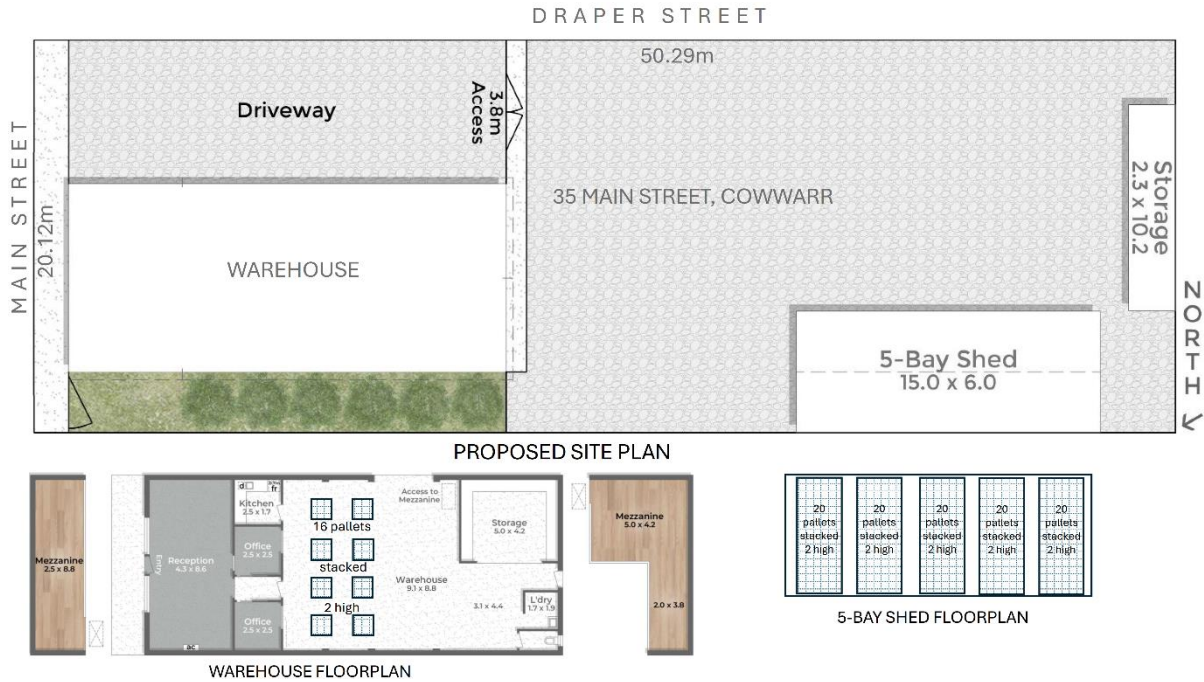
Site and floorplans showing how the fertiliser will be stored in the two buildings on the property
